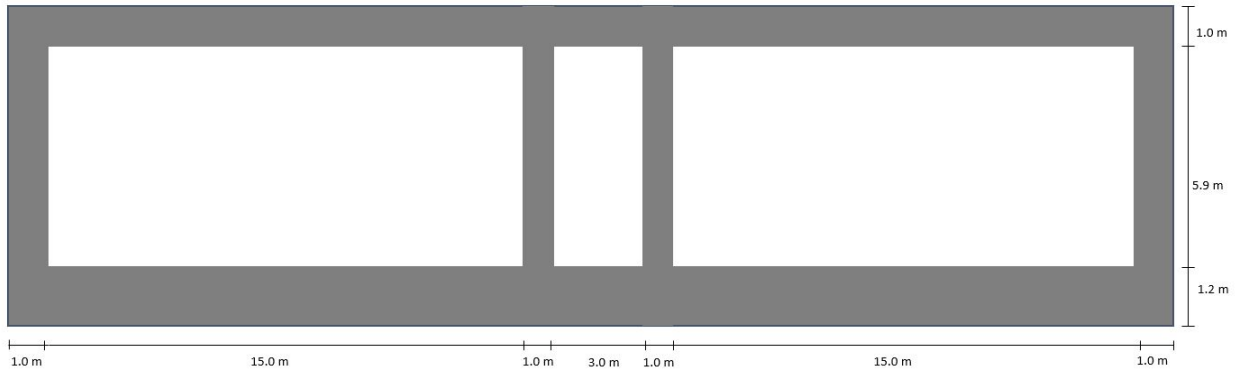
Cross-section for reinforced concrete immersed tunnel
